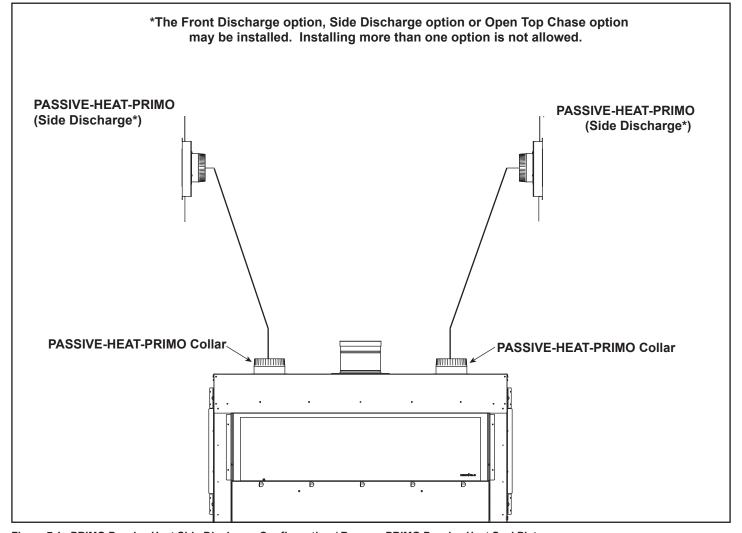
PRIMO Passive Heat Side Discharge Configuration / Remove PRIMO Passive Heat Seal Plates
